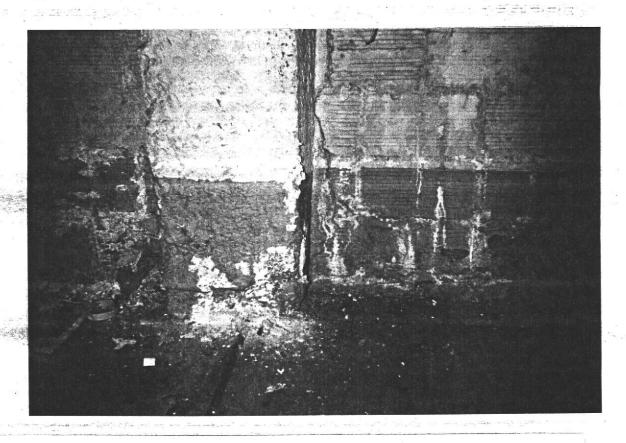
Close-Up View of Column Base Shown on Photo 2, Photo Taken after Sampling of Residue 4525 Horton Street, Emeryville, California 14 October 1996
